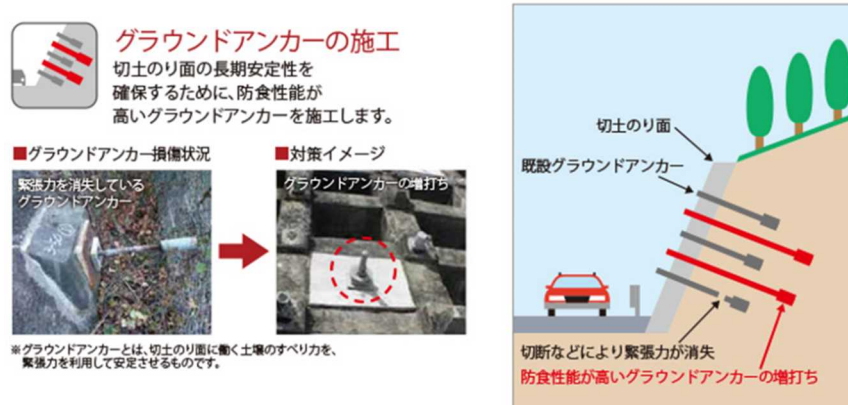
Detailed Work on Earthwork Structure (Slope Reinforcement)⁷
